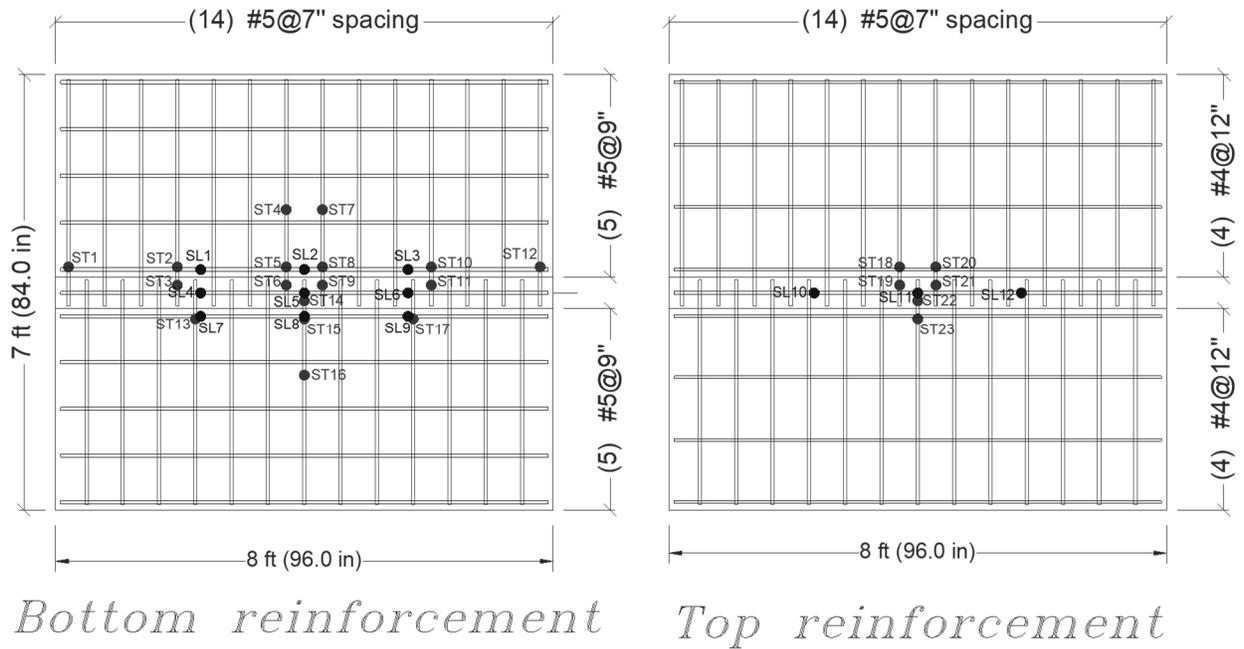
Structural details and instrumentation plan for the longitudinal specimen (SP-4).
